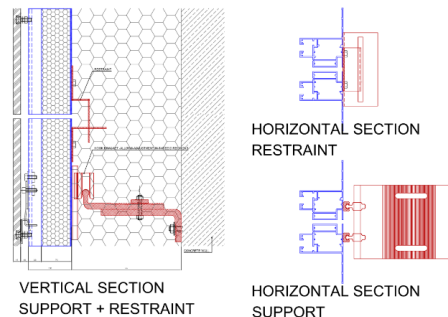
Macro-panel frame anchoring system to the concrete slab, as for curtain wall
